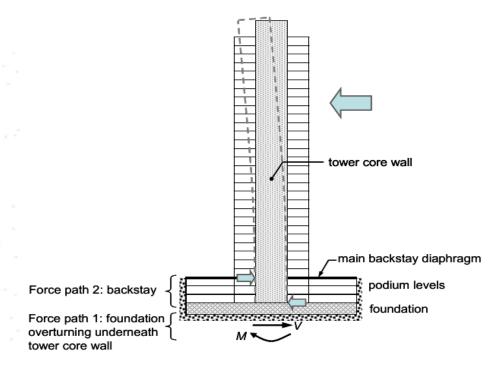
Lateral load transfer mechanism in a RC frame-wall building with basement stories (ATC, 2010)
